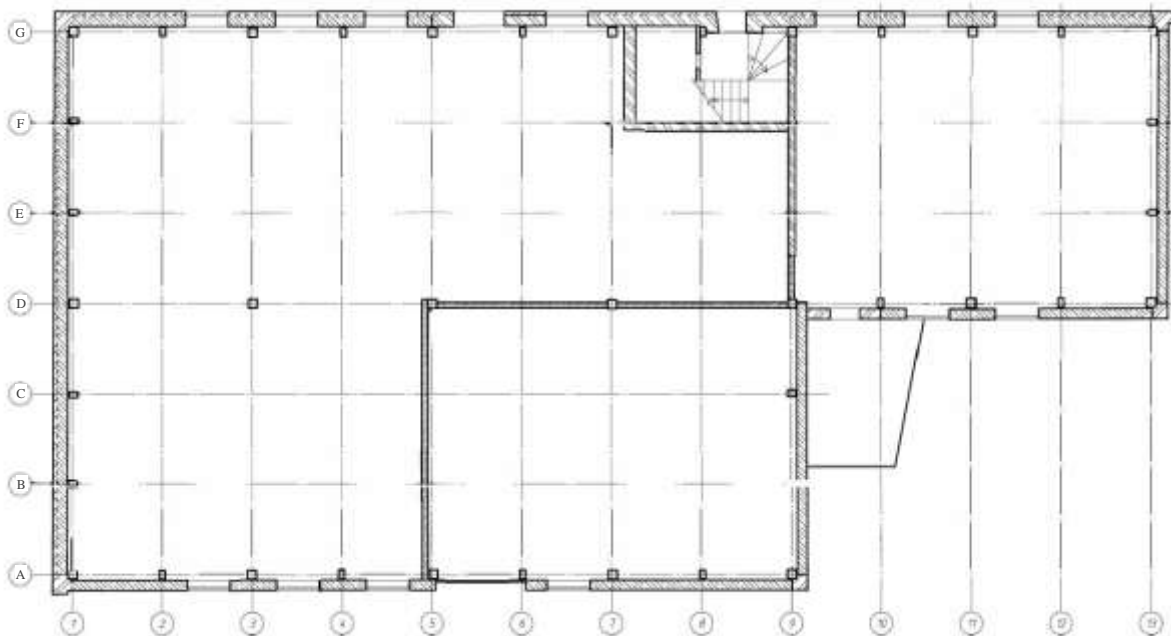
Scheme of the building under study in the axes 1–13/A–G
